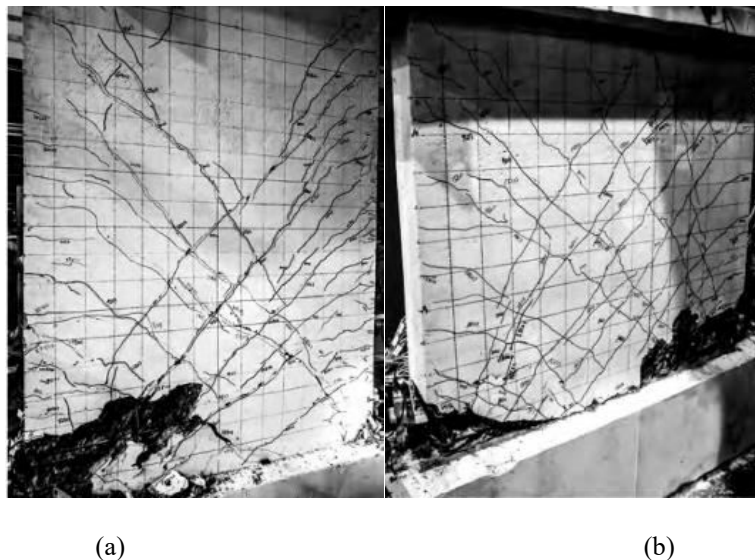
Failure modes of shear walls (a) Cast-in-place concrete shear wall (b) insulated composite shear wall
